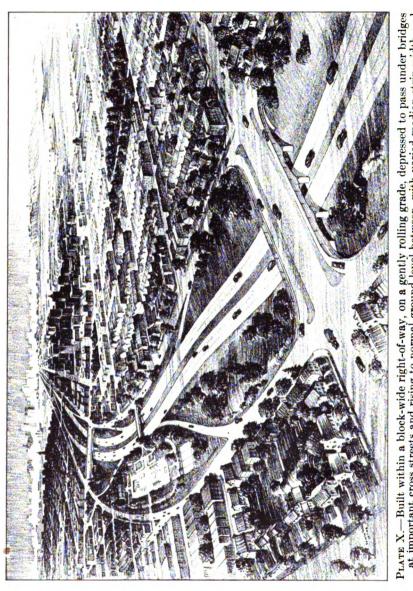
PLATE X.—Built within a block-wide right-of-way, on a gently rolling grade, depressed to pass under bridges at important cross streets and rising to normal ground level between, with varied median strip width and use of border areas for suitable neighborhood recreational purposes, a section of the interregional system shown in this sketch,
